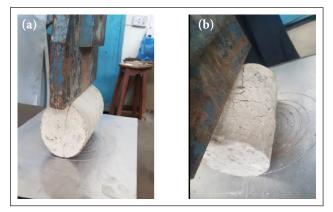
A typical failure pattern is exhibited by (a) plain concrete and (b) JFRC specimens under tensile splitting.
